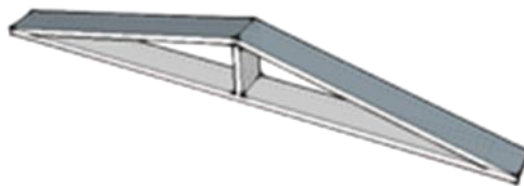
Final roof structure model, which is only a section of the initial roof frame
